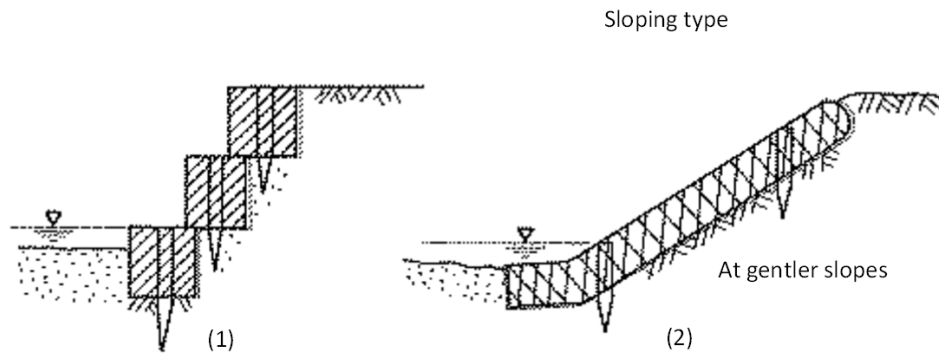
Gabion revetment work and sloping type of Revetment work
